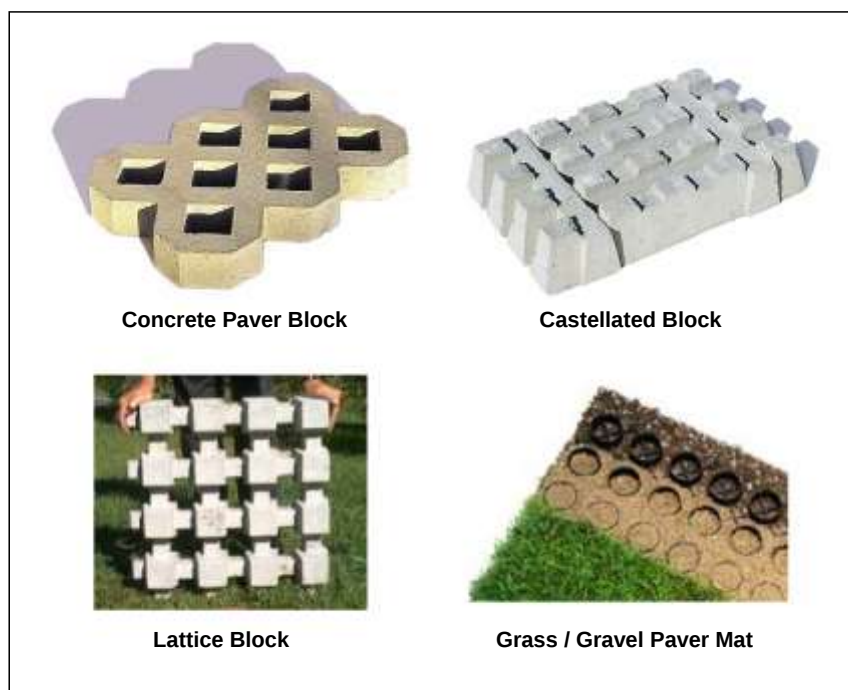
Typical Modular Porous Permeable Paver System Applications
